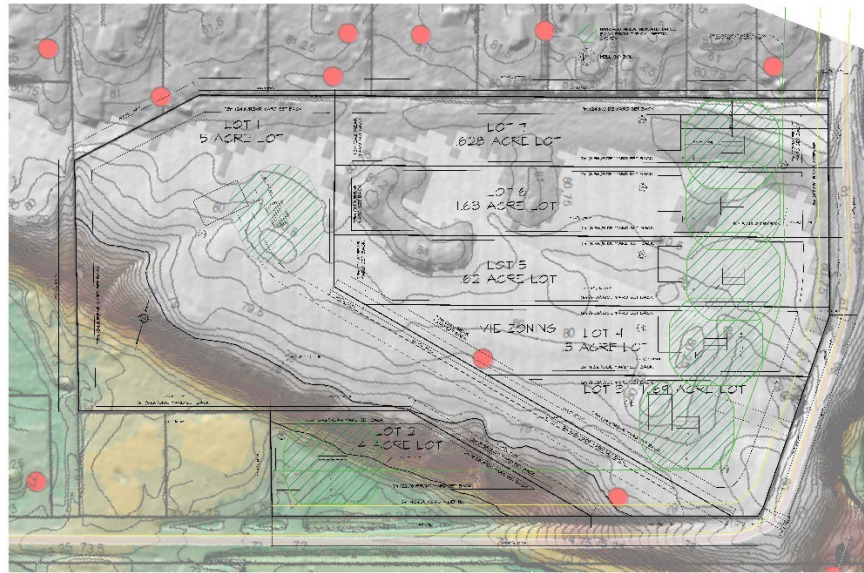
Extract of Site Plan - Overlay on the Terrain
